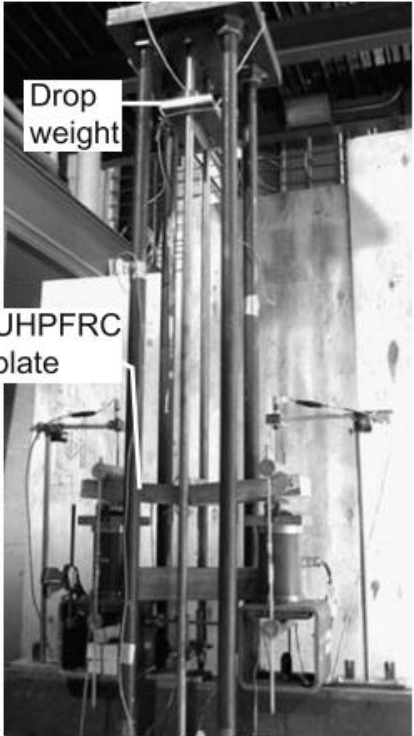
Impact test on concrete beam used by (Wang et al. 1996).
